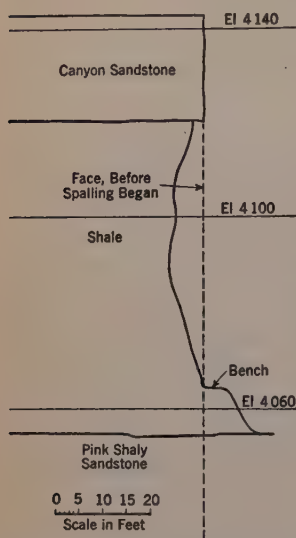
SECTION OF NORTH ABUTMENT BREAKING BACK OF SHALE
